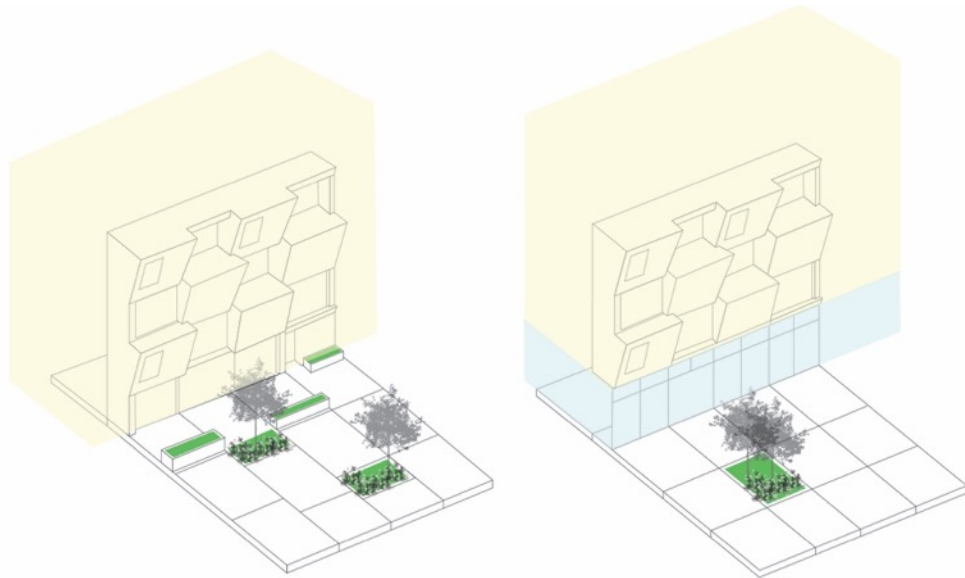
Wide Street Edge Condition, Residential or Mixed Use (Author)
